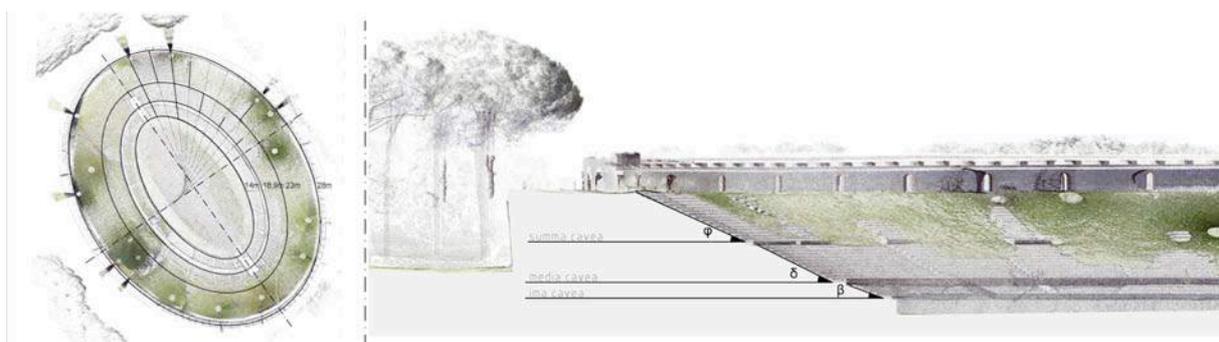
Geometrical test and evaluation about slope on plan and vertical sections.
